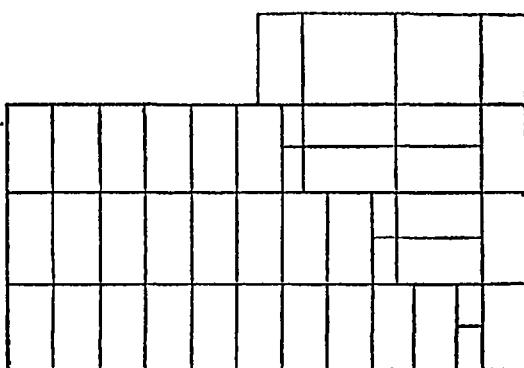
is a vertical section through a brick wall 3 bricks thick built in English bond. Scale = $\frac{1}{10}$.
